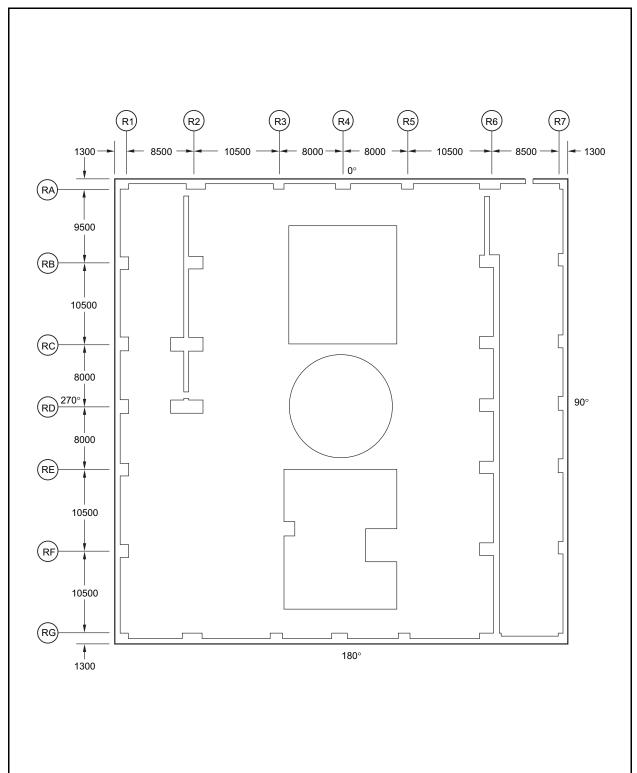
Reactor Building Arrangement Floor 4F Elevation 31700 mm
